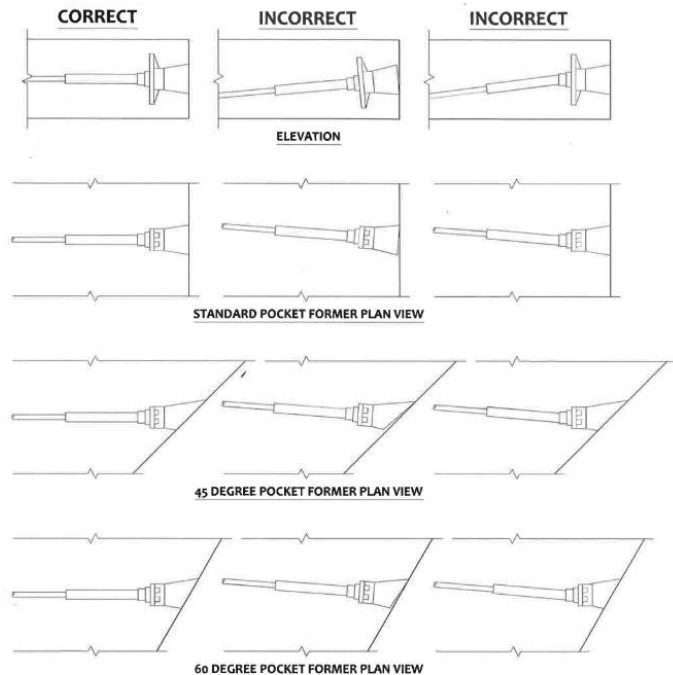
Anchor and pocket former to be installed perpendicular to edge form.
